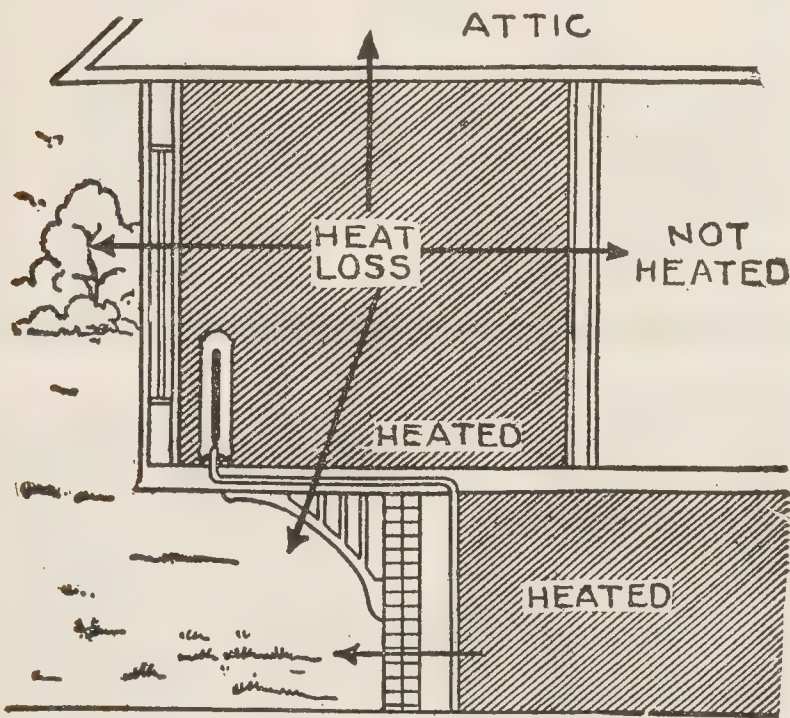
,546.—Heat losses due to exposed floor, ceilings and walls.
